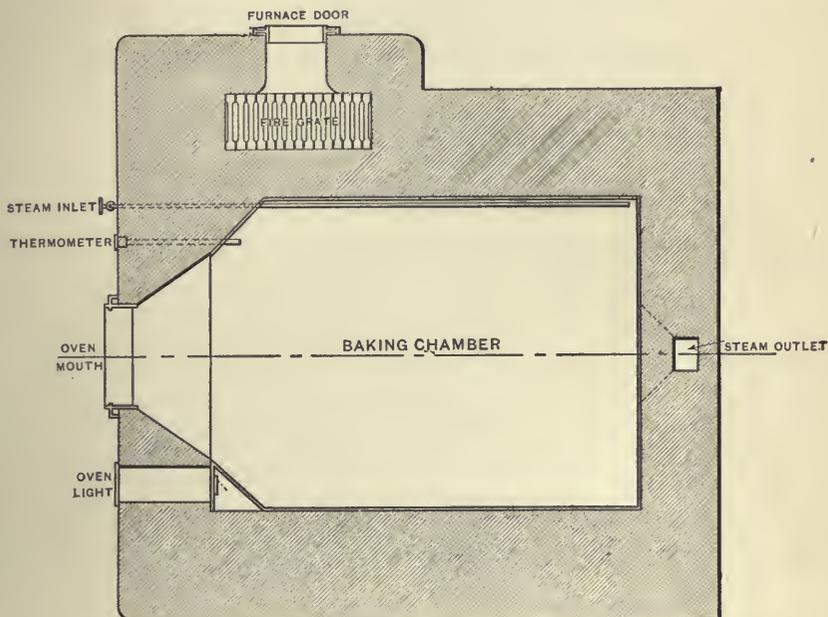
“Viennara” Patent Steam-pipe Oven : Sectional Plan
